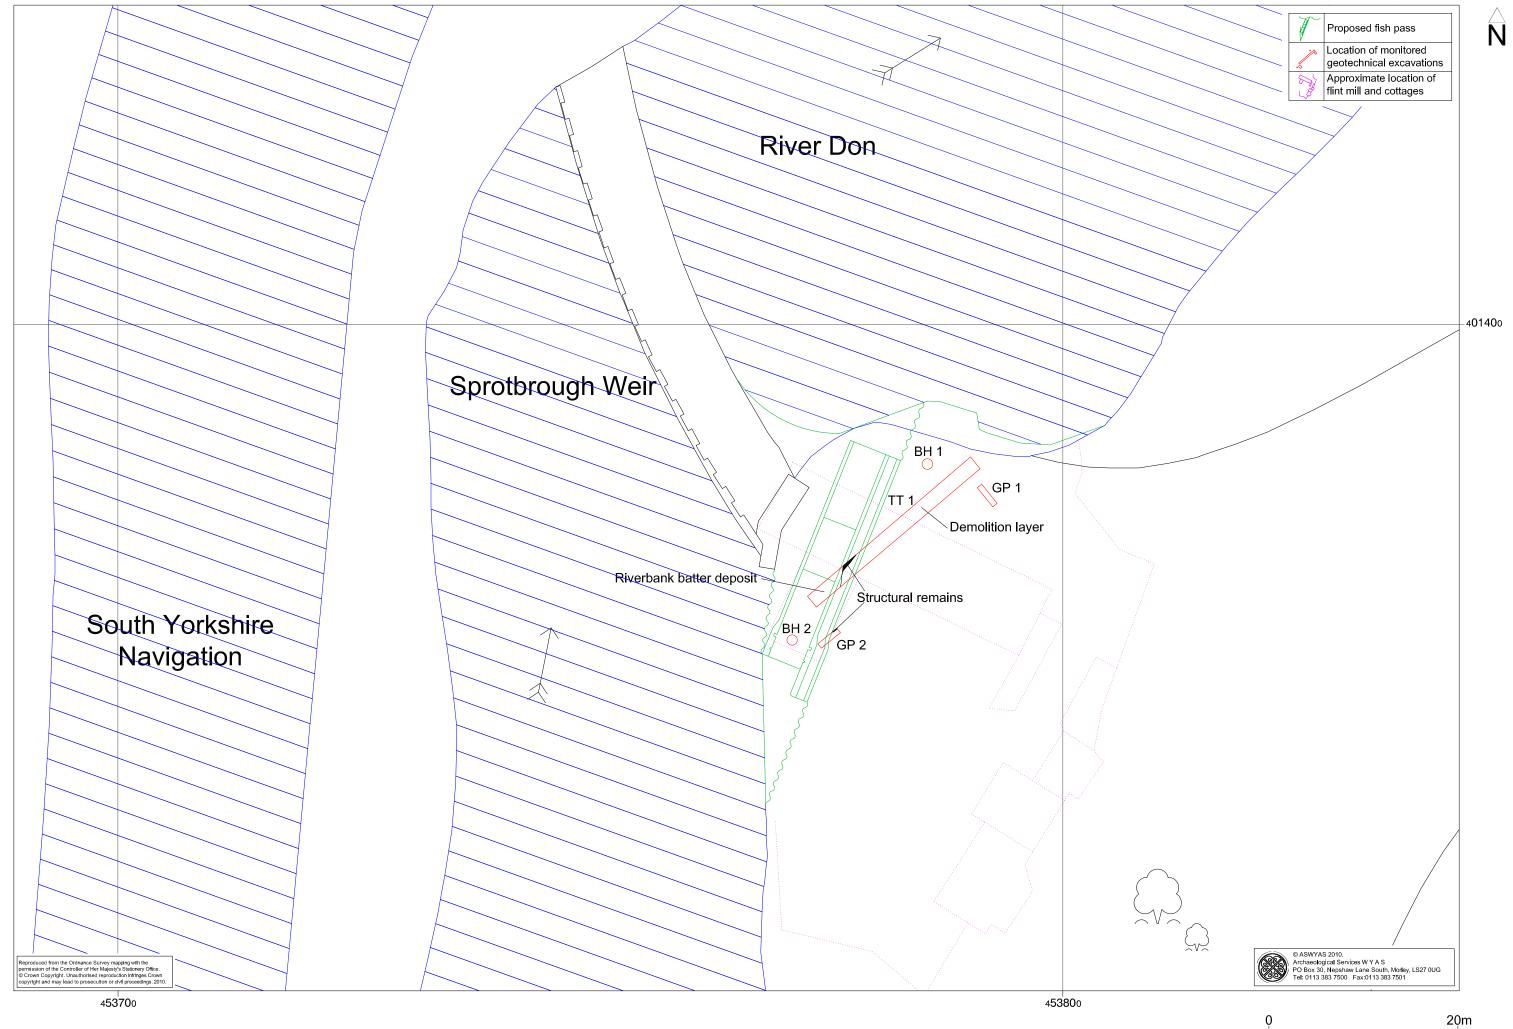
Site plan showing the locations of the proposed fish pass, geotechnical excavations and the flint mill and cottages (1:400 @ A3)
